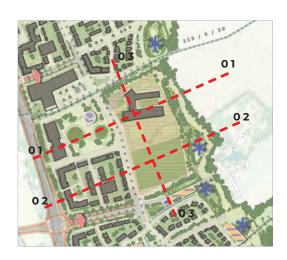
Site Section 03- North to South, cutting through the school building and showing the level difference between
